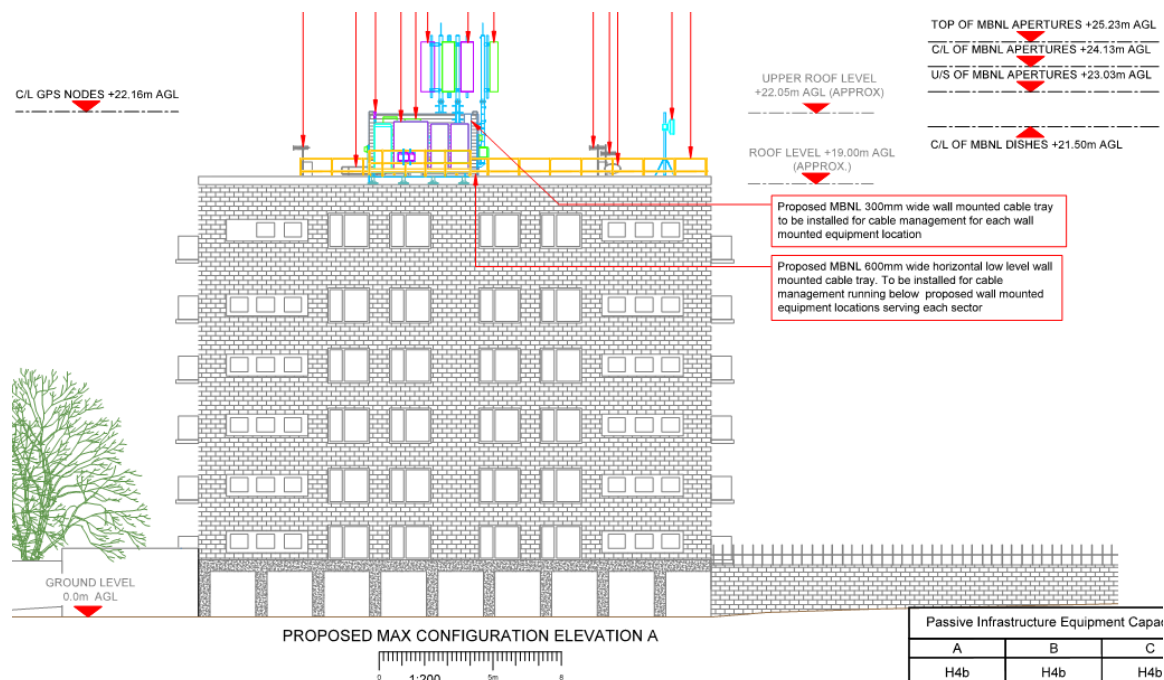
Proposed Elevation A (extract taken from drawing 265-A MAX CONFIGURATION ELEVATION Issue C)
